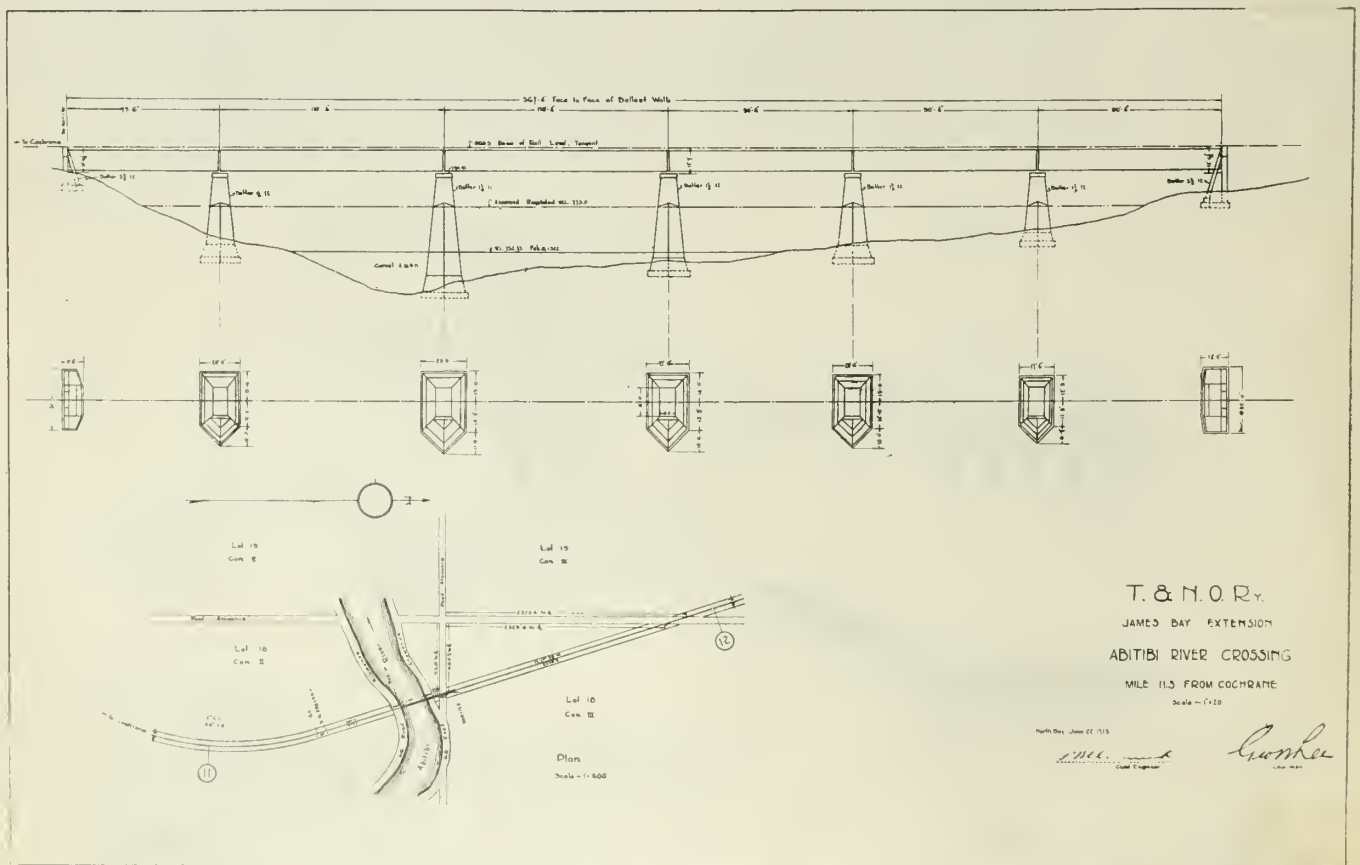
Plan of Bridge at First Abitibi Crossing, T. & N.O. Ry.
